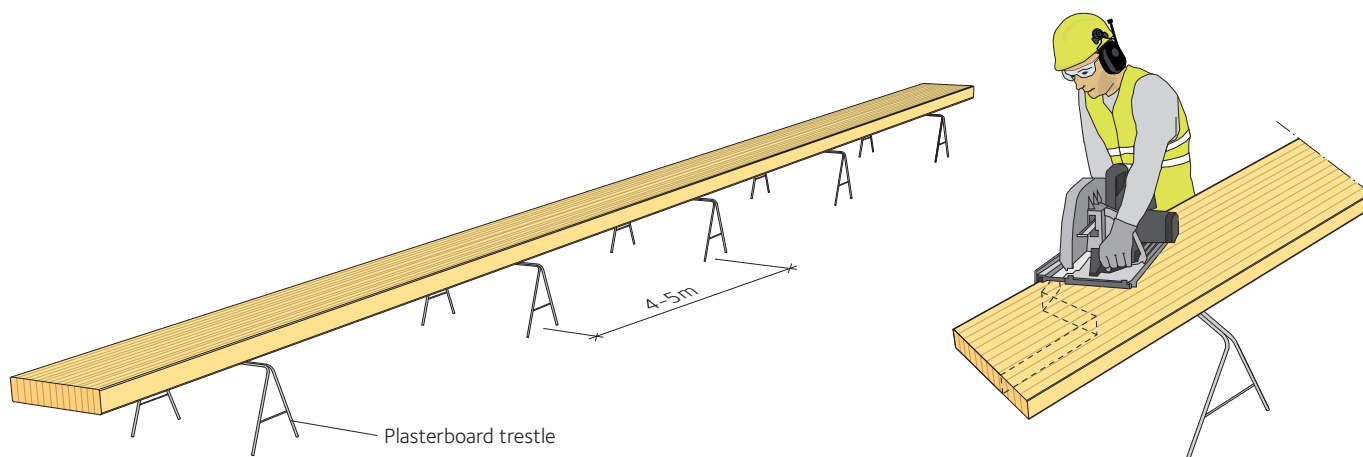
Plasterboard trestles can be used for machining glulam elements on site
